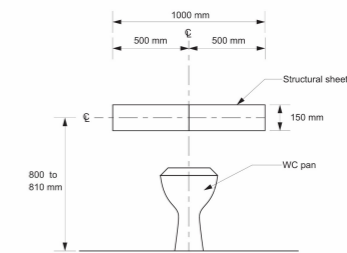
Location of noggings for a wall behind a toilet pan
